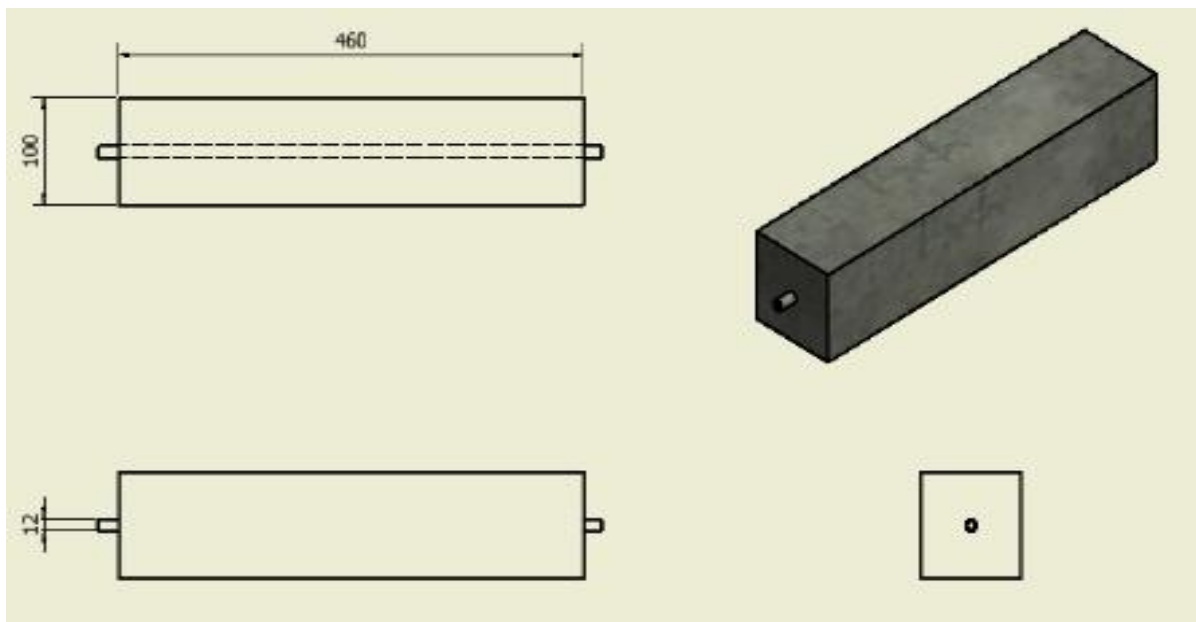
Schematic diagram of the reinforced LWFC concrete beam and its dimensions after hardening.
